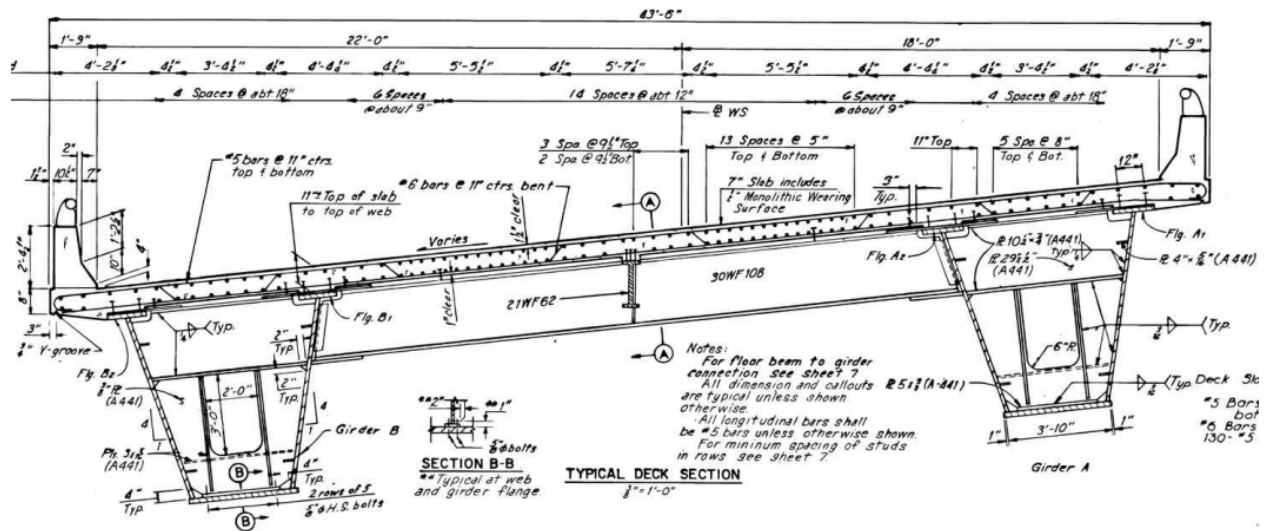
Typical cross section of Fremont Bridge based on original drawings.
